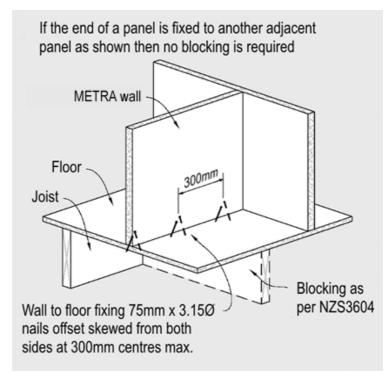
External/Internal Wall to Floor Fixing – Timber Floor
